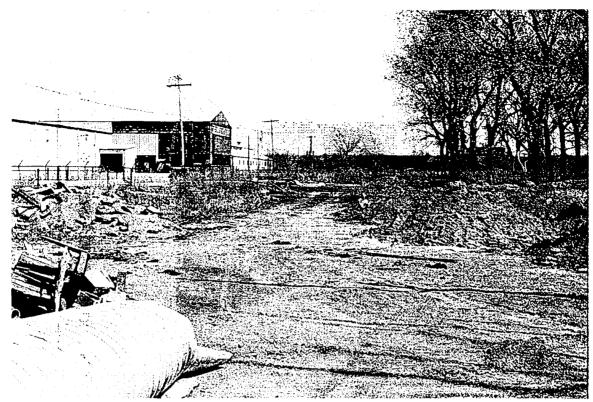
Additional view of debris pile #5. Shows black corrugated plastic pipe and white PVC pipe. Facing north. (Peter Gorton, April 1998.)
